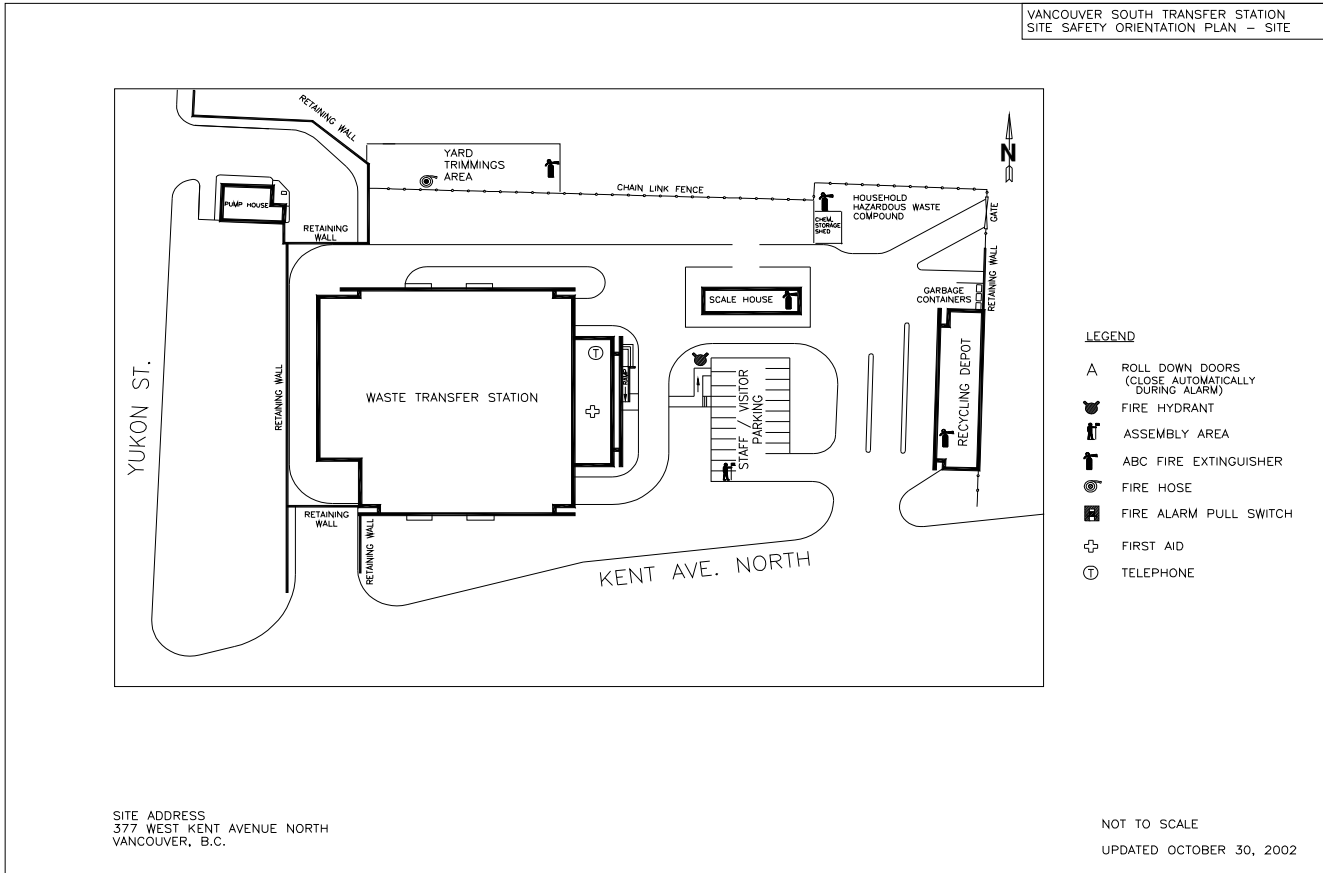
Vancouver South Transfer Station, Site, Plan View
